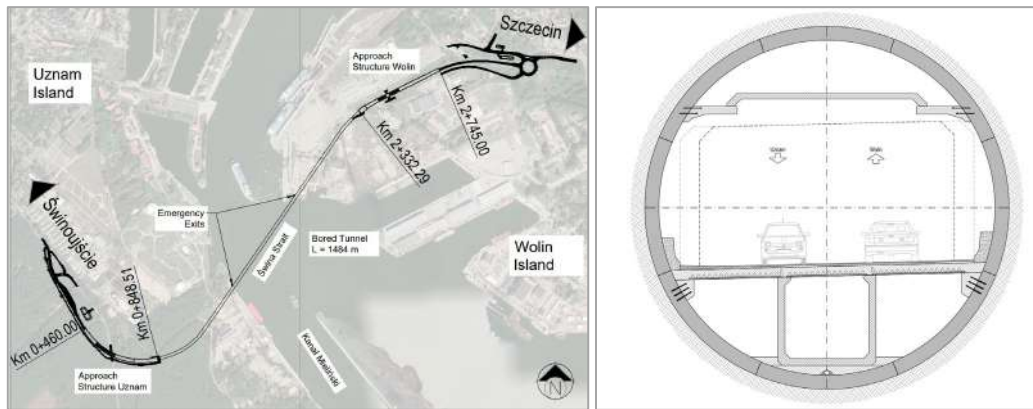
Key plan of the project (left) and typical cross section of TBM tunnel (right).
